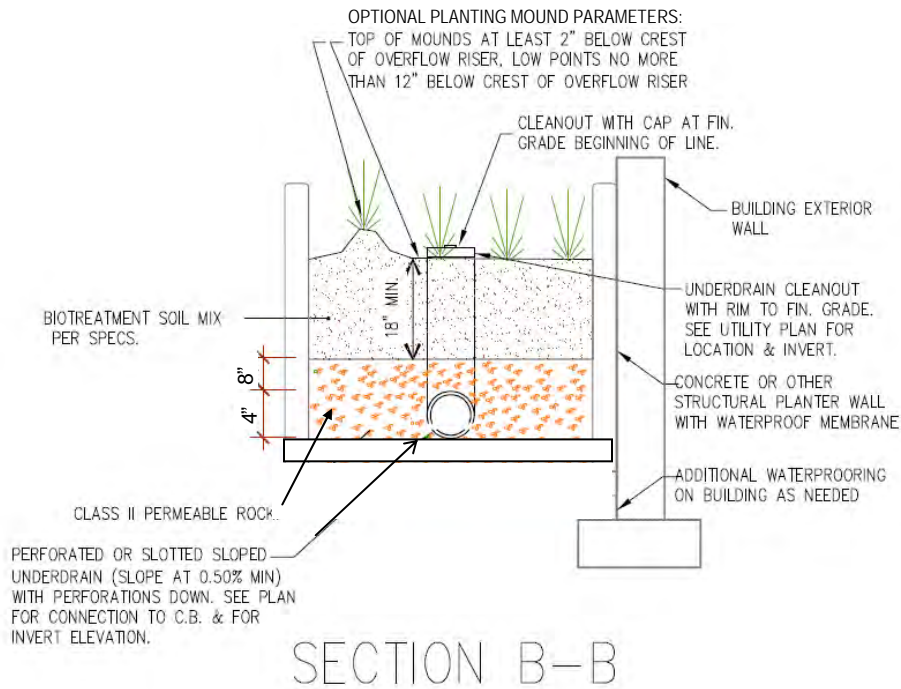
Cross section B-B of flow-through planter, shows cross section of underdrain
